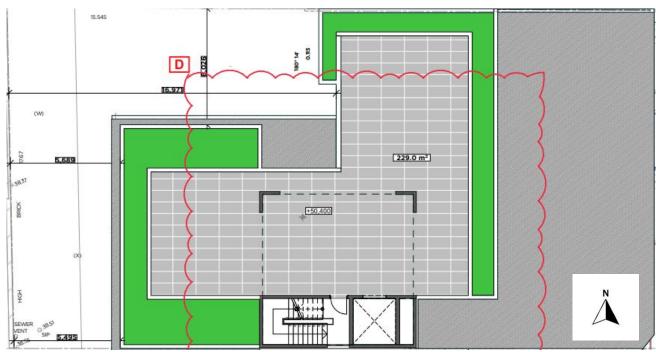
Rooftop plan of the development, as currently approved. Source: Urban Link Architects.
